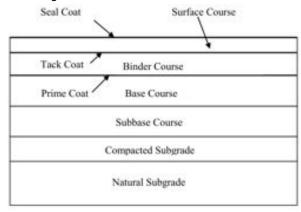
Cross section of a flexible pavement (Modified from Huang, 2004)
